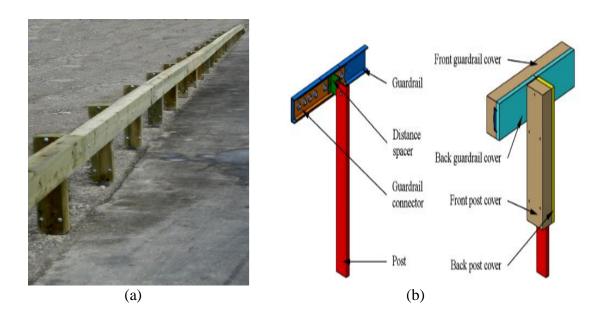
(a) Wooden barrier reinforced by steel, (b) (left) Structural steel profile, (right) covered by wood [68].
